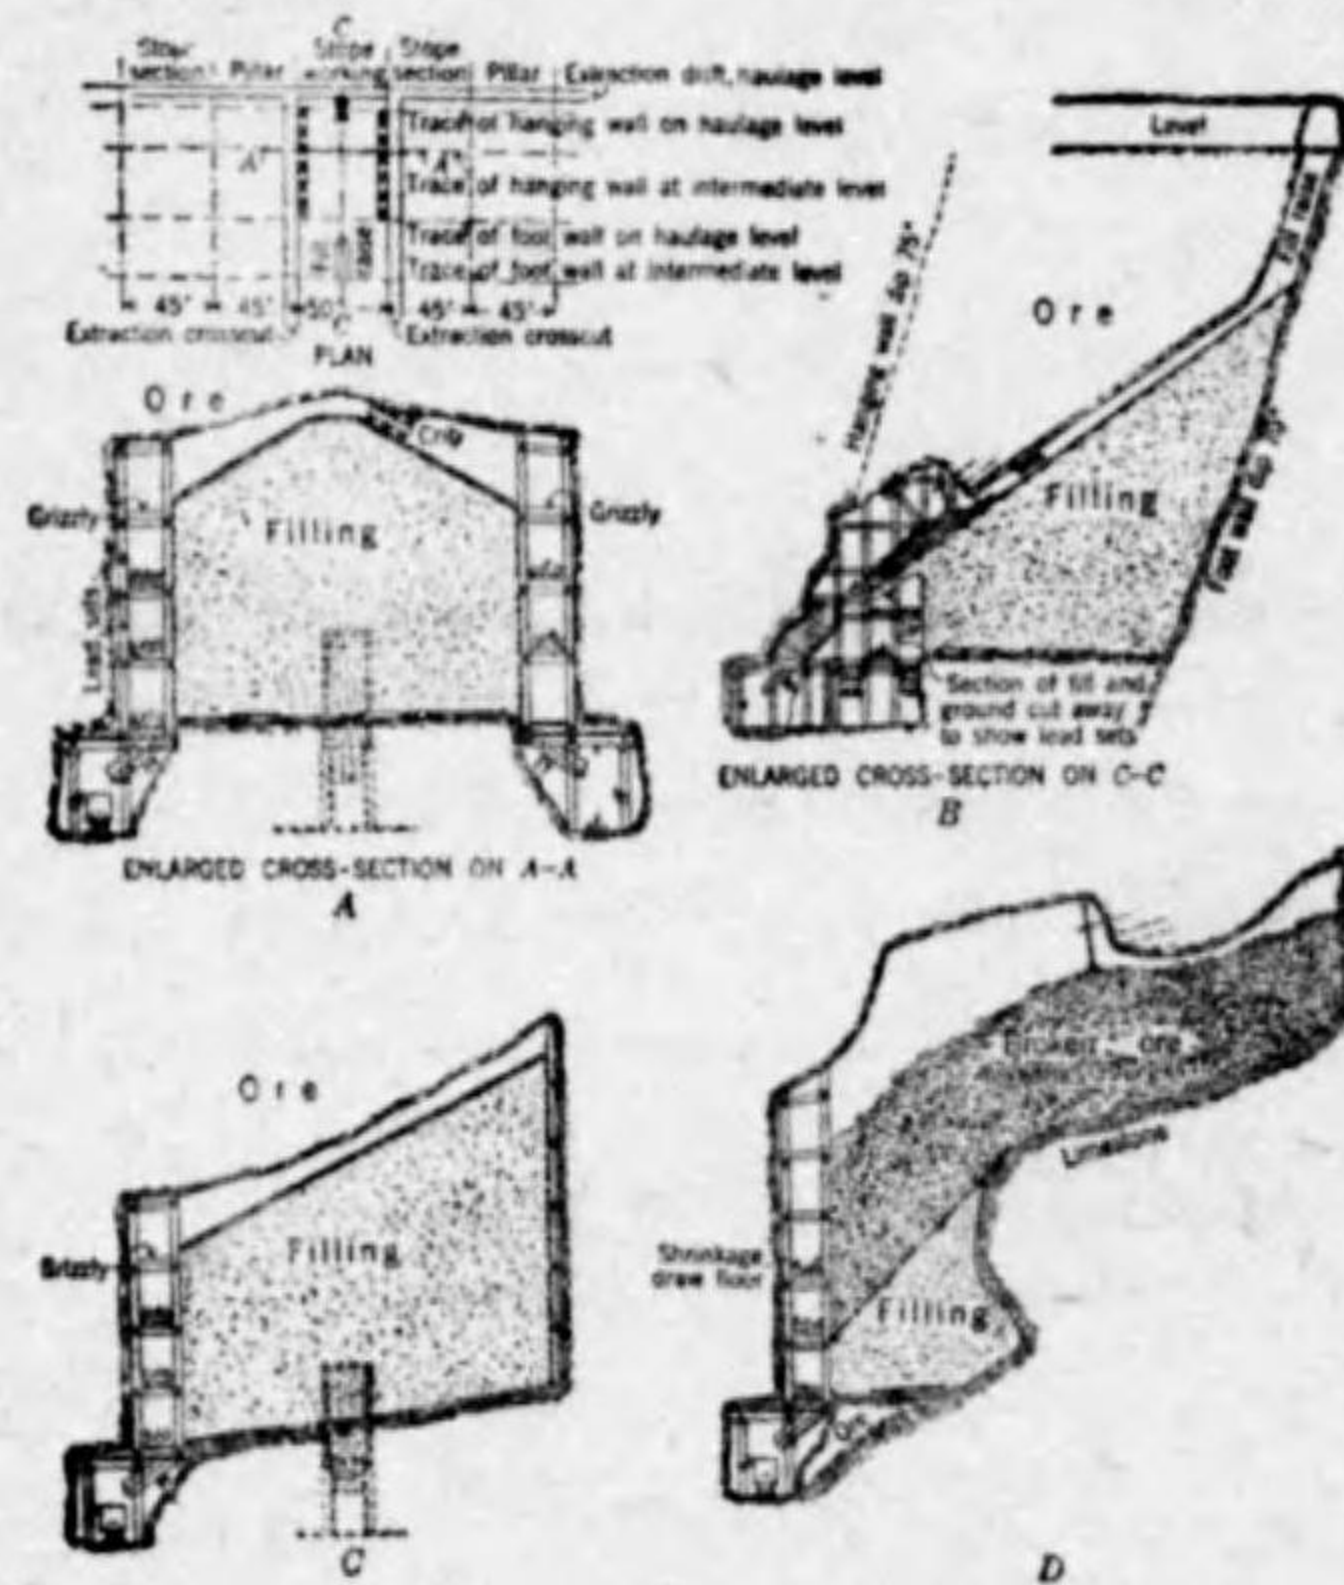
Inclined cut-and-fill stoping system. Campbell mine, Arizona; A, Plan and section of double-lead stope; B, cross section on lines C—C of plan; C, cross section, single-lead stope; D, section of semi-shrinkage stope.
